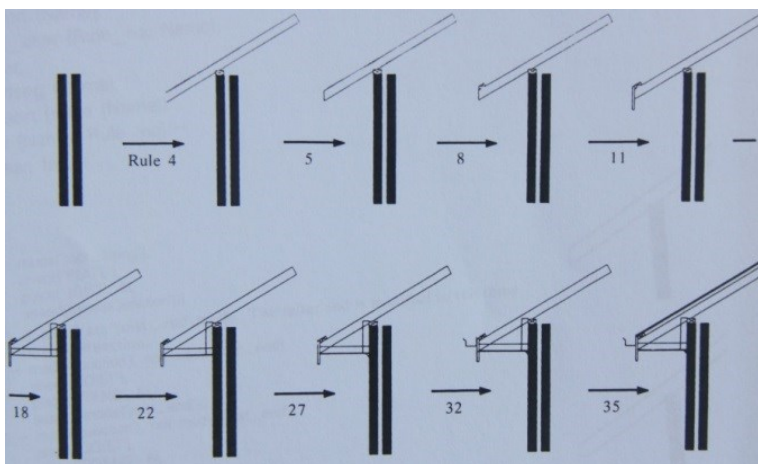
An example of EAVE design through sequential application of rules (Mitchel and Radford, 1987)
